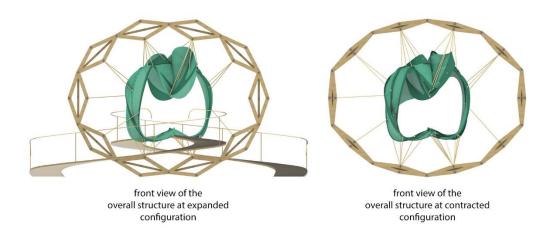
The Front Views of the Cable-Suspended Pavilion at an Expanded and Contracted Configuration
